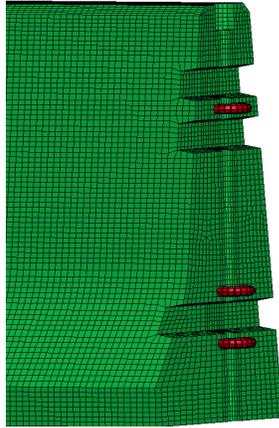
Isometric View of Modified Barrier Segment FE Model.
